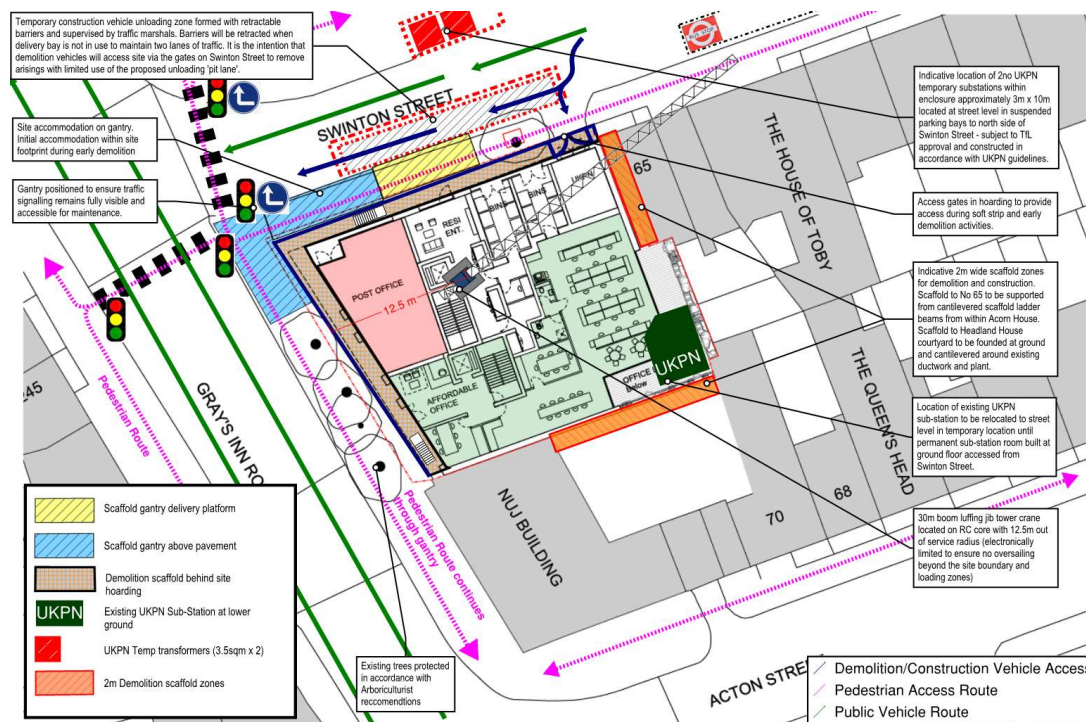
Extract of Logistics Plan indicating construction vehicle access/egress location on Swinton Street
